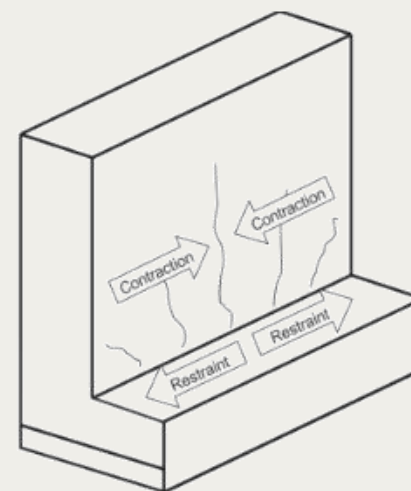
Early-age cracking in the walls of a box-section tunnel wall
